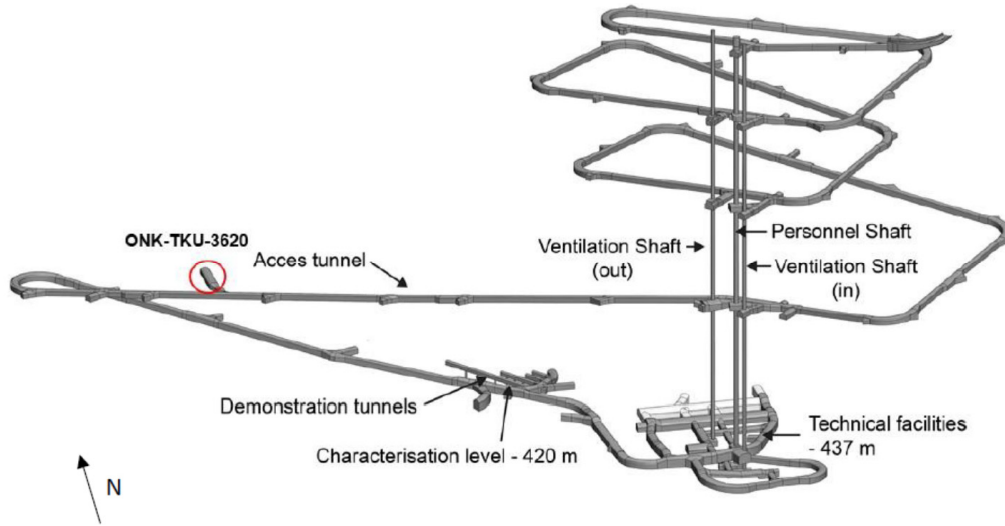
Geometry of underground facility in ONKALO facility and the location of EDZ study area (Follin et al., 2021)
